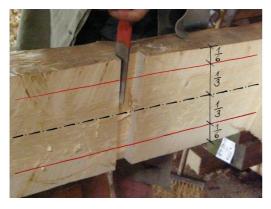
Undercutting two-thirds of the inner central part of the joint, contact surfaces remain only along the edges of the joint
